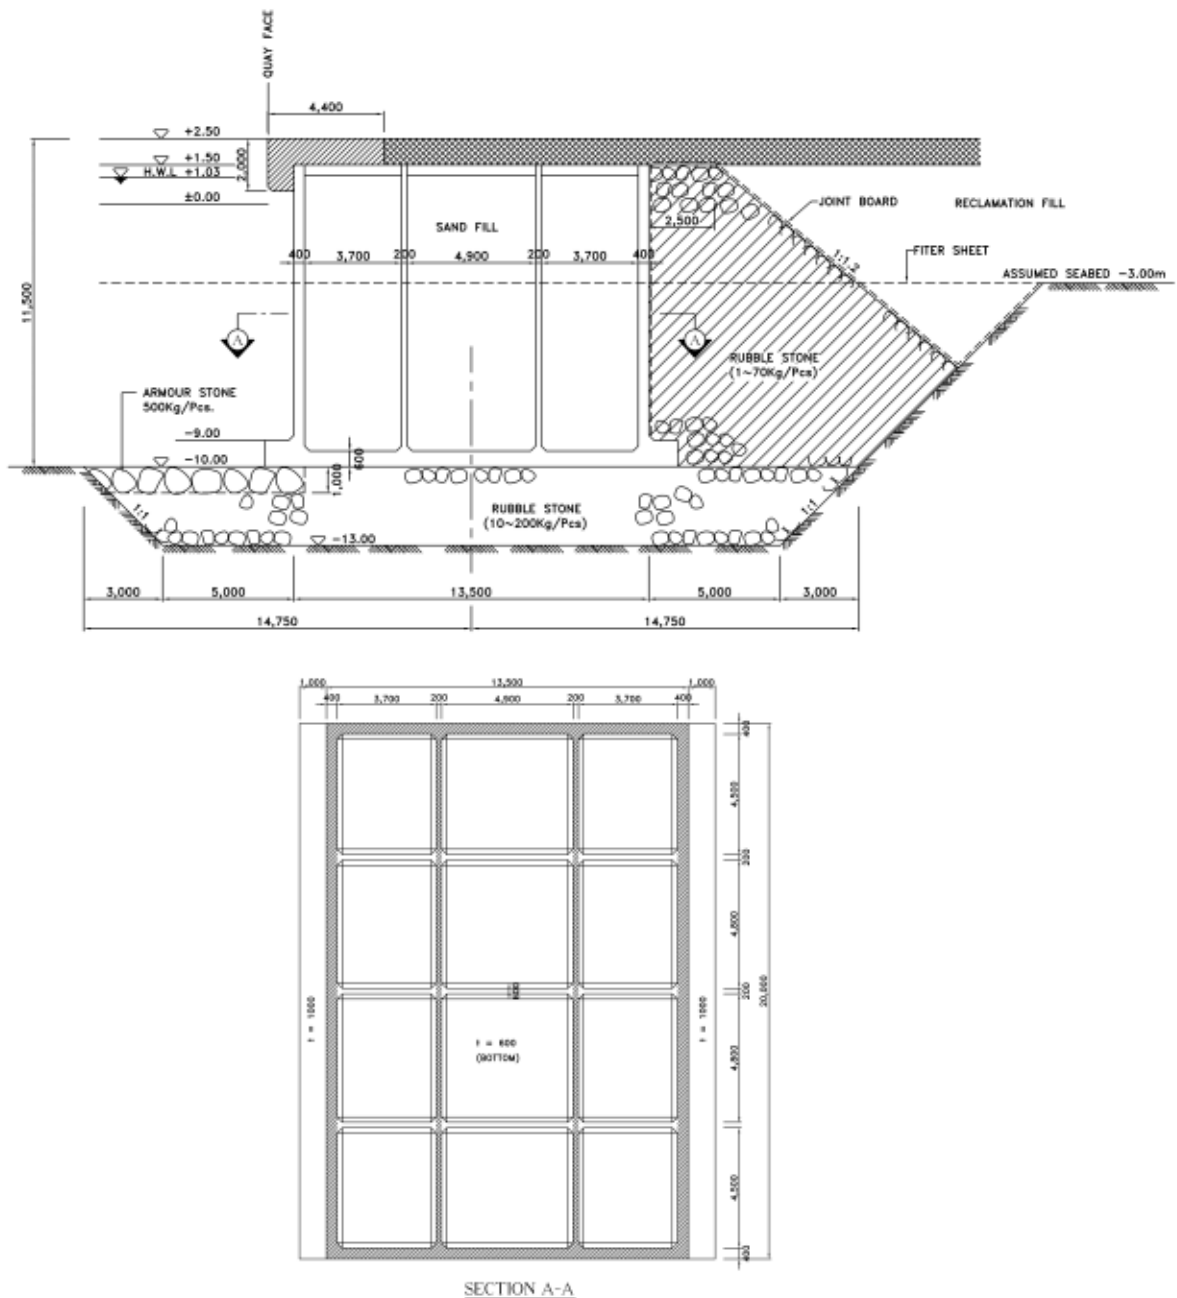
C-3 Typical Cross Section of Multi Purpose Quay Wall of Bojonegara (Concrete Caisson, -10 m)
